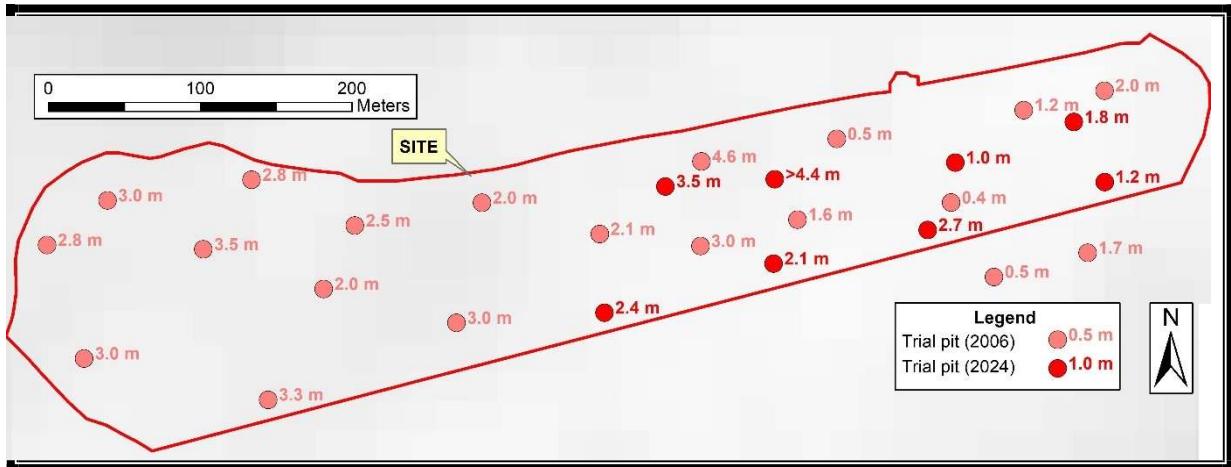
Point depths to bedrock at trial pit localities excavated across the proposed LRD Site area.
